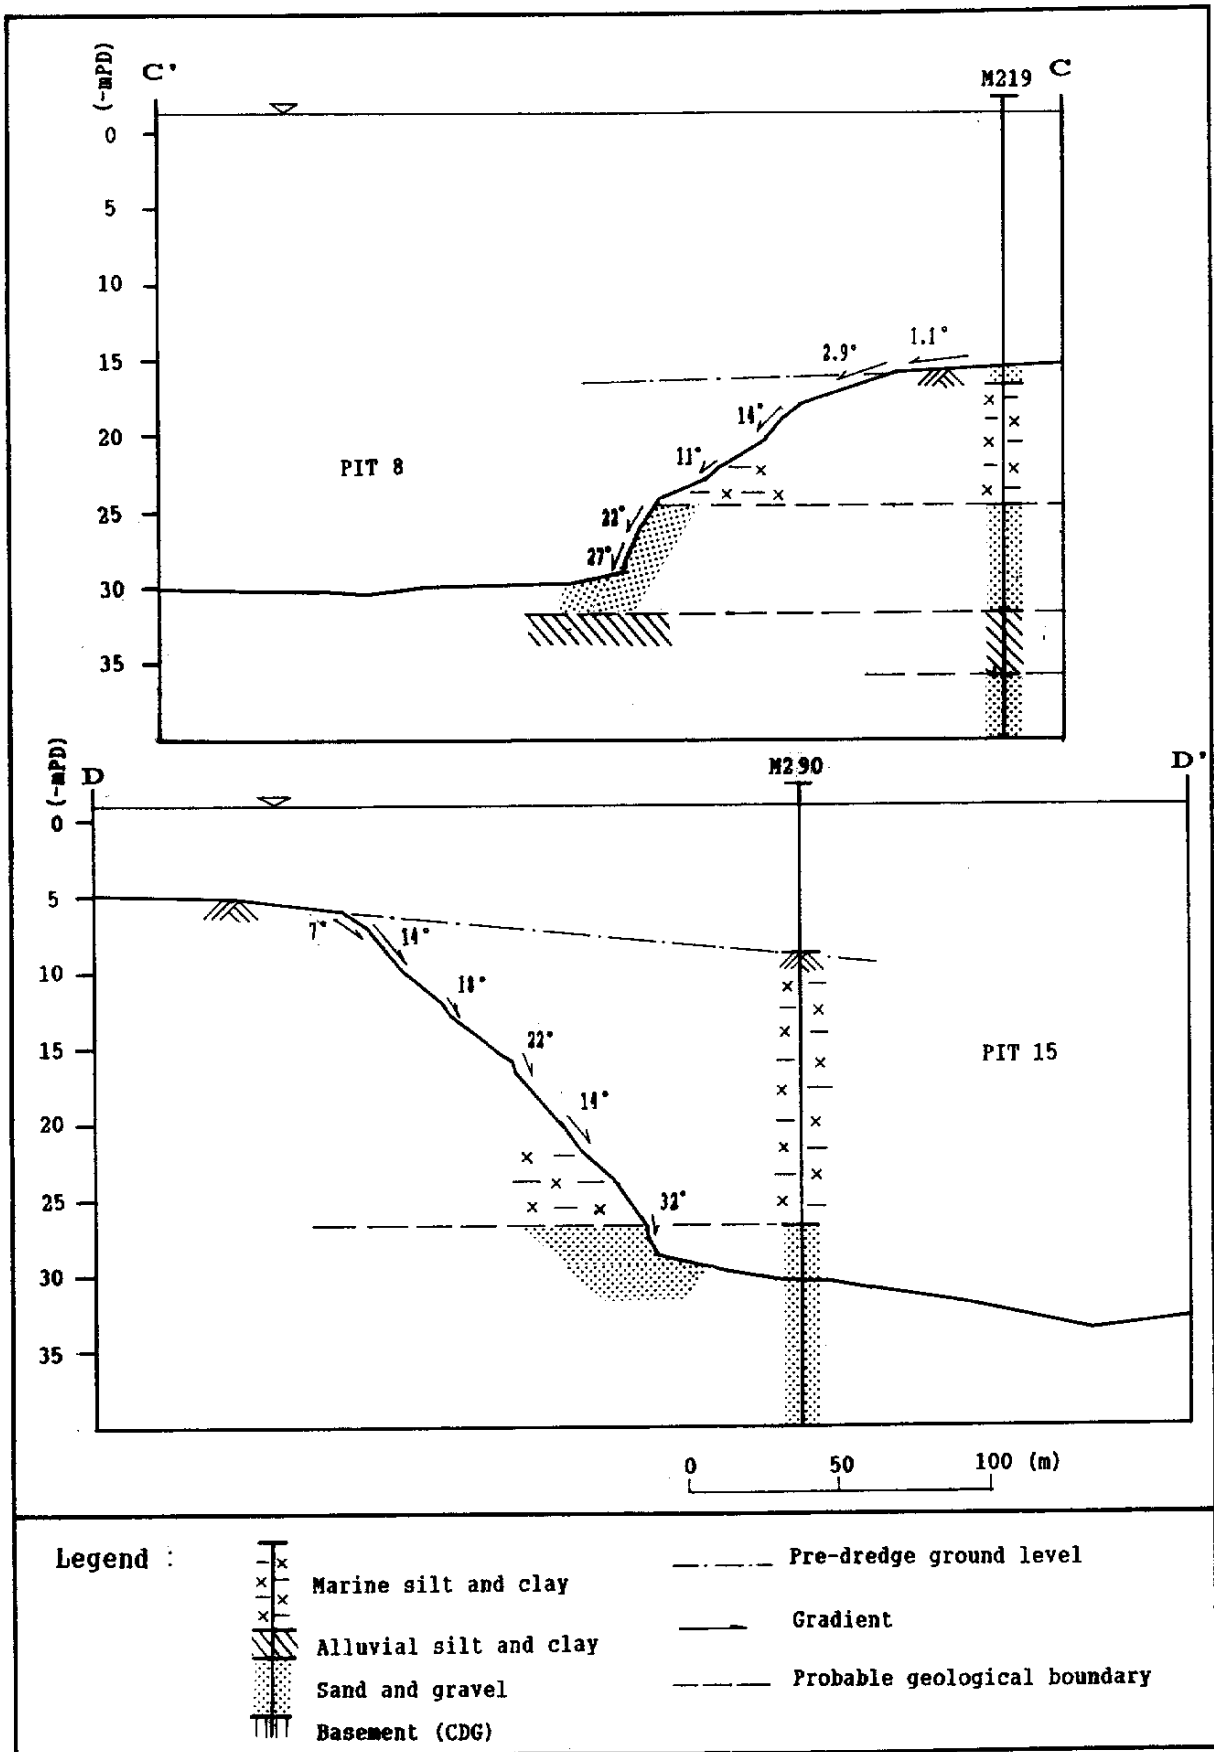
Urmston Road Borrow Pits, Cross-sections C-C' and D-D'
